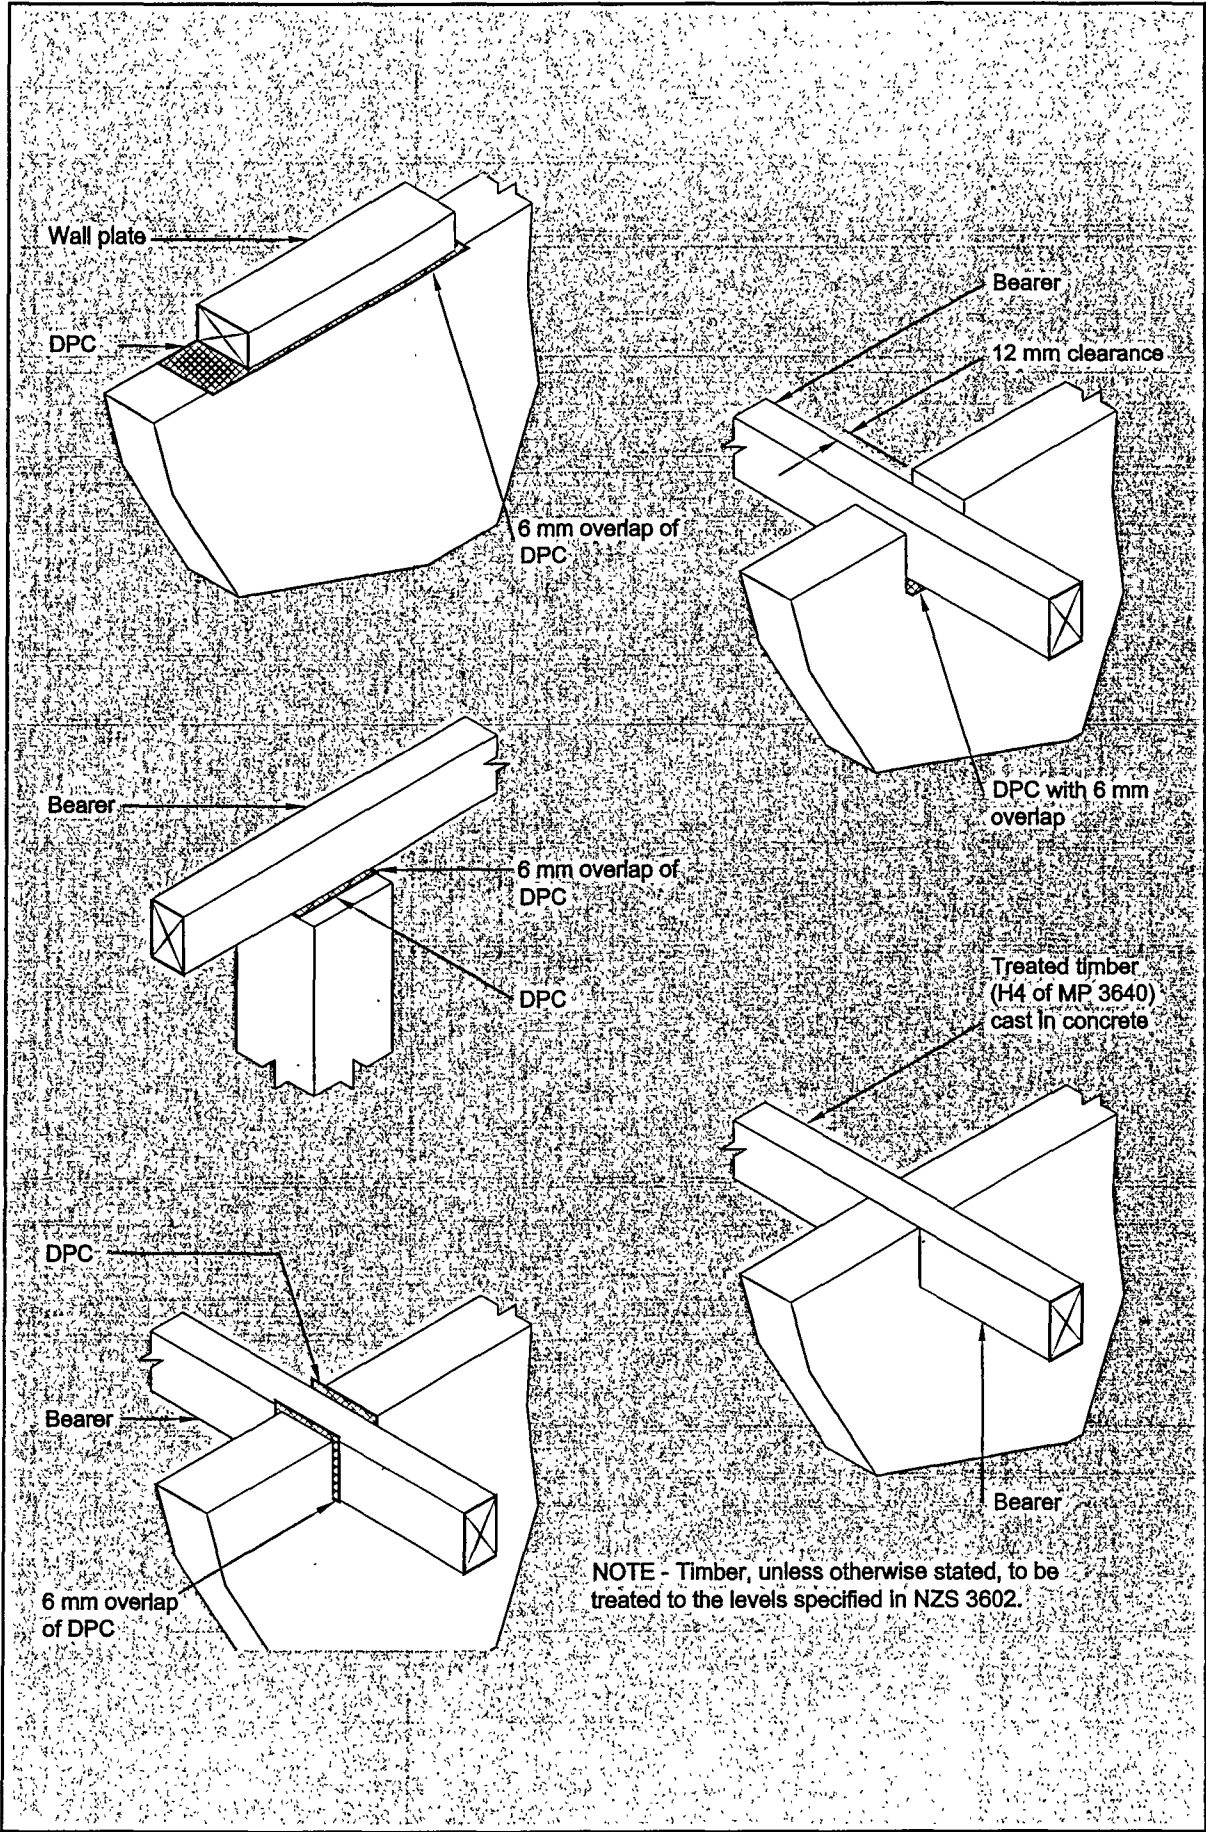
Protection of subfloor framing timber from direct contact with concrete (see 2.3.3)
